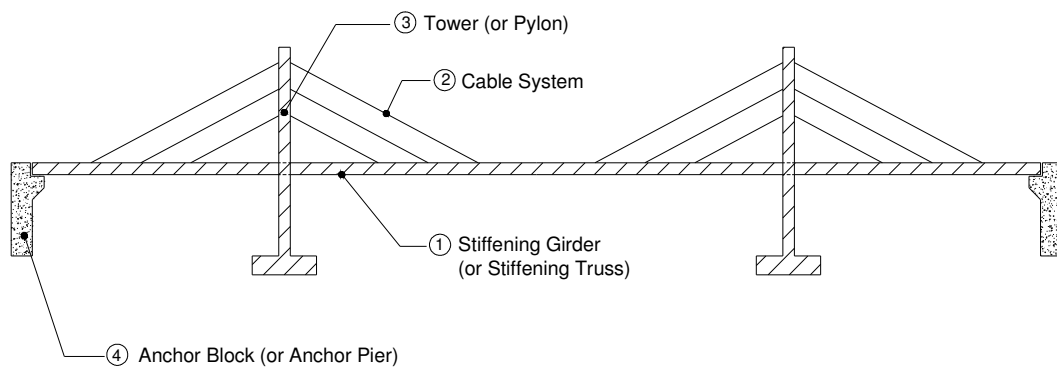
Structural system definition of cable-stayed bridges [5]
